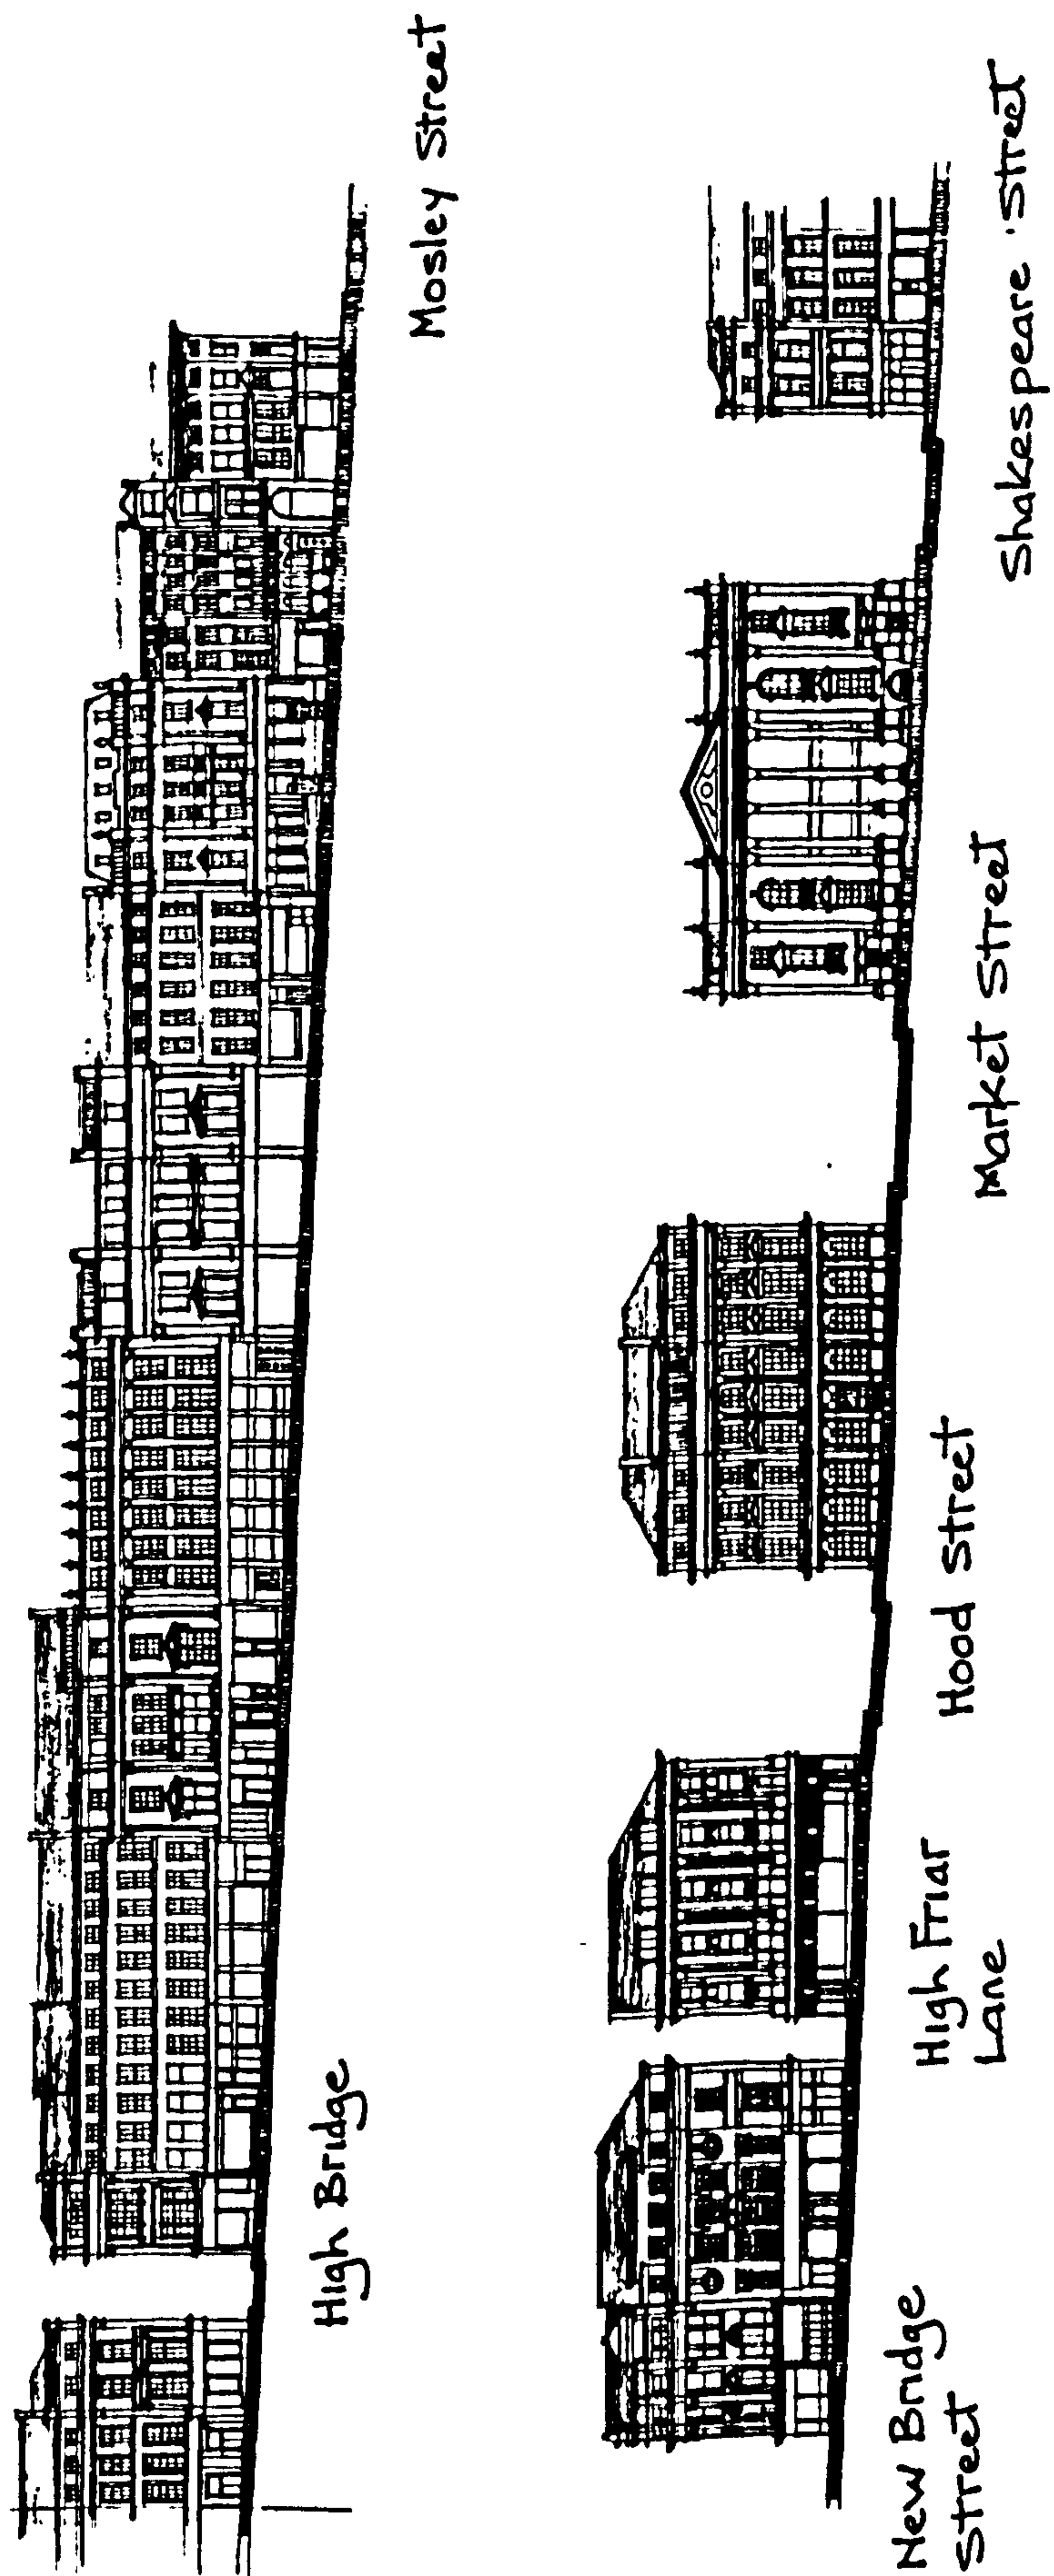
GREY STREET EAST SIDE ELEVATIONS 1991
